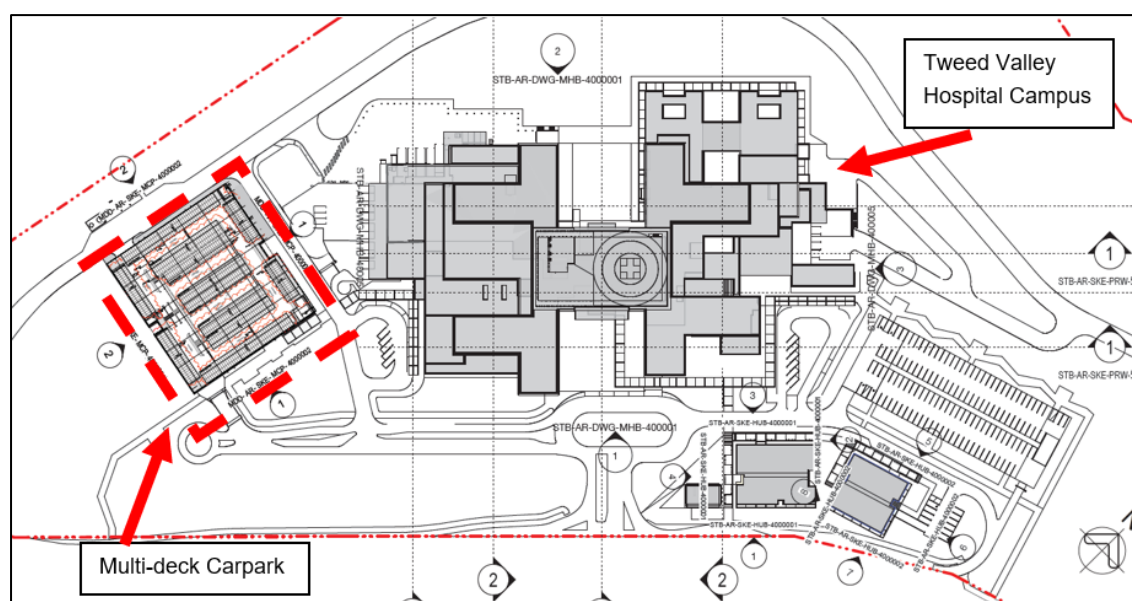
| Site Plan (Base source: SSD-10353-Mod-3 Architectural Plans)
